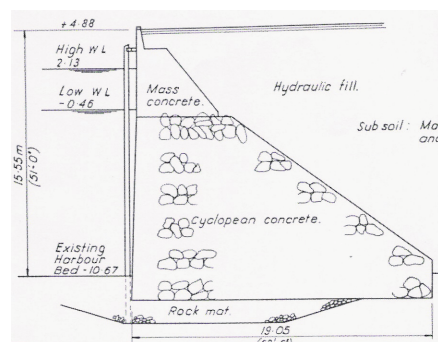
Cross-section of quay wall long beach, USA 1959 [Bertlin & Partners 1970]
